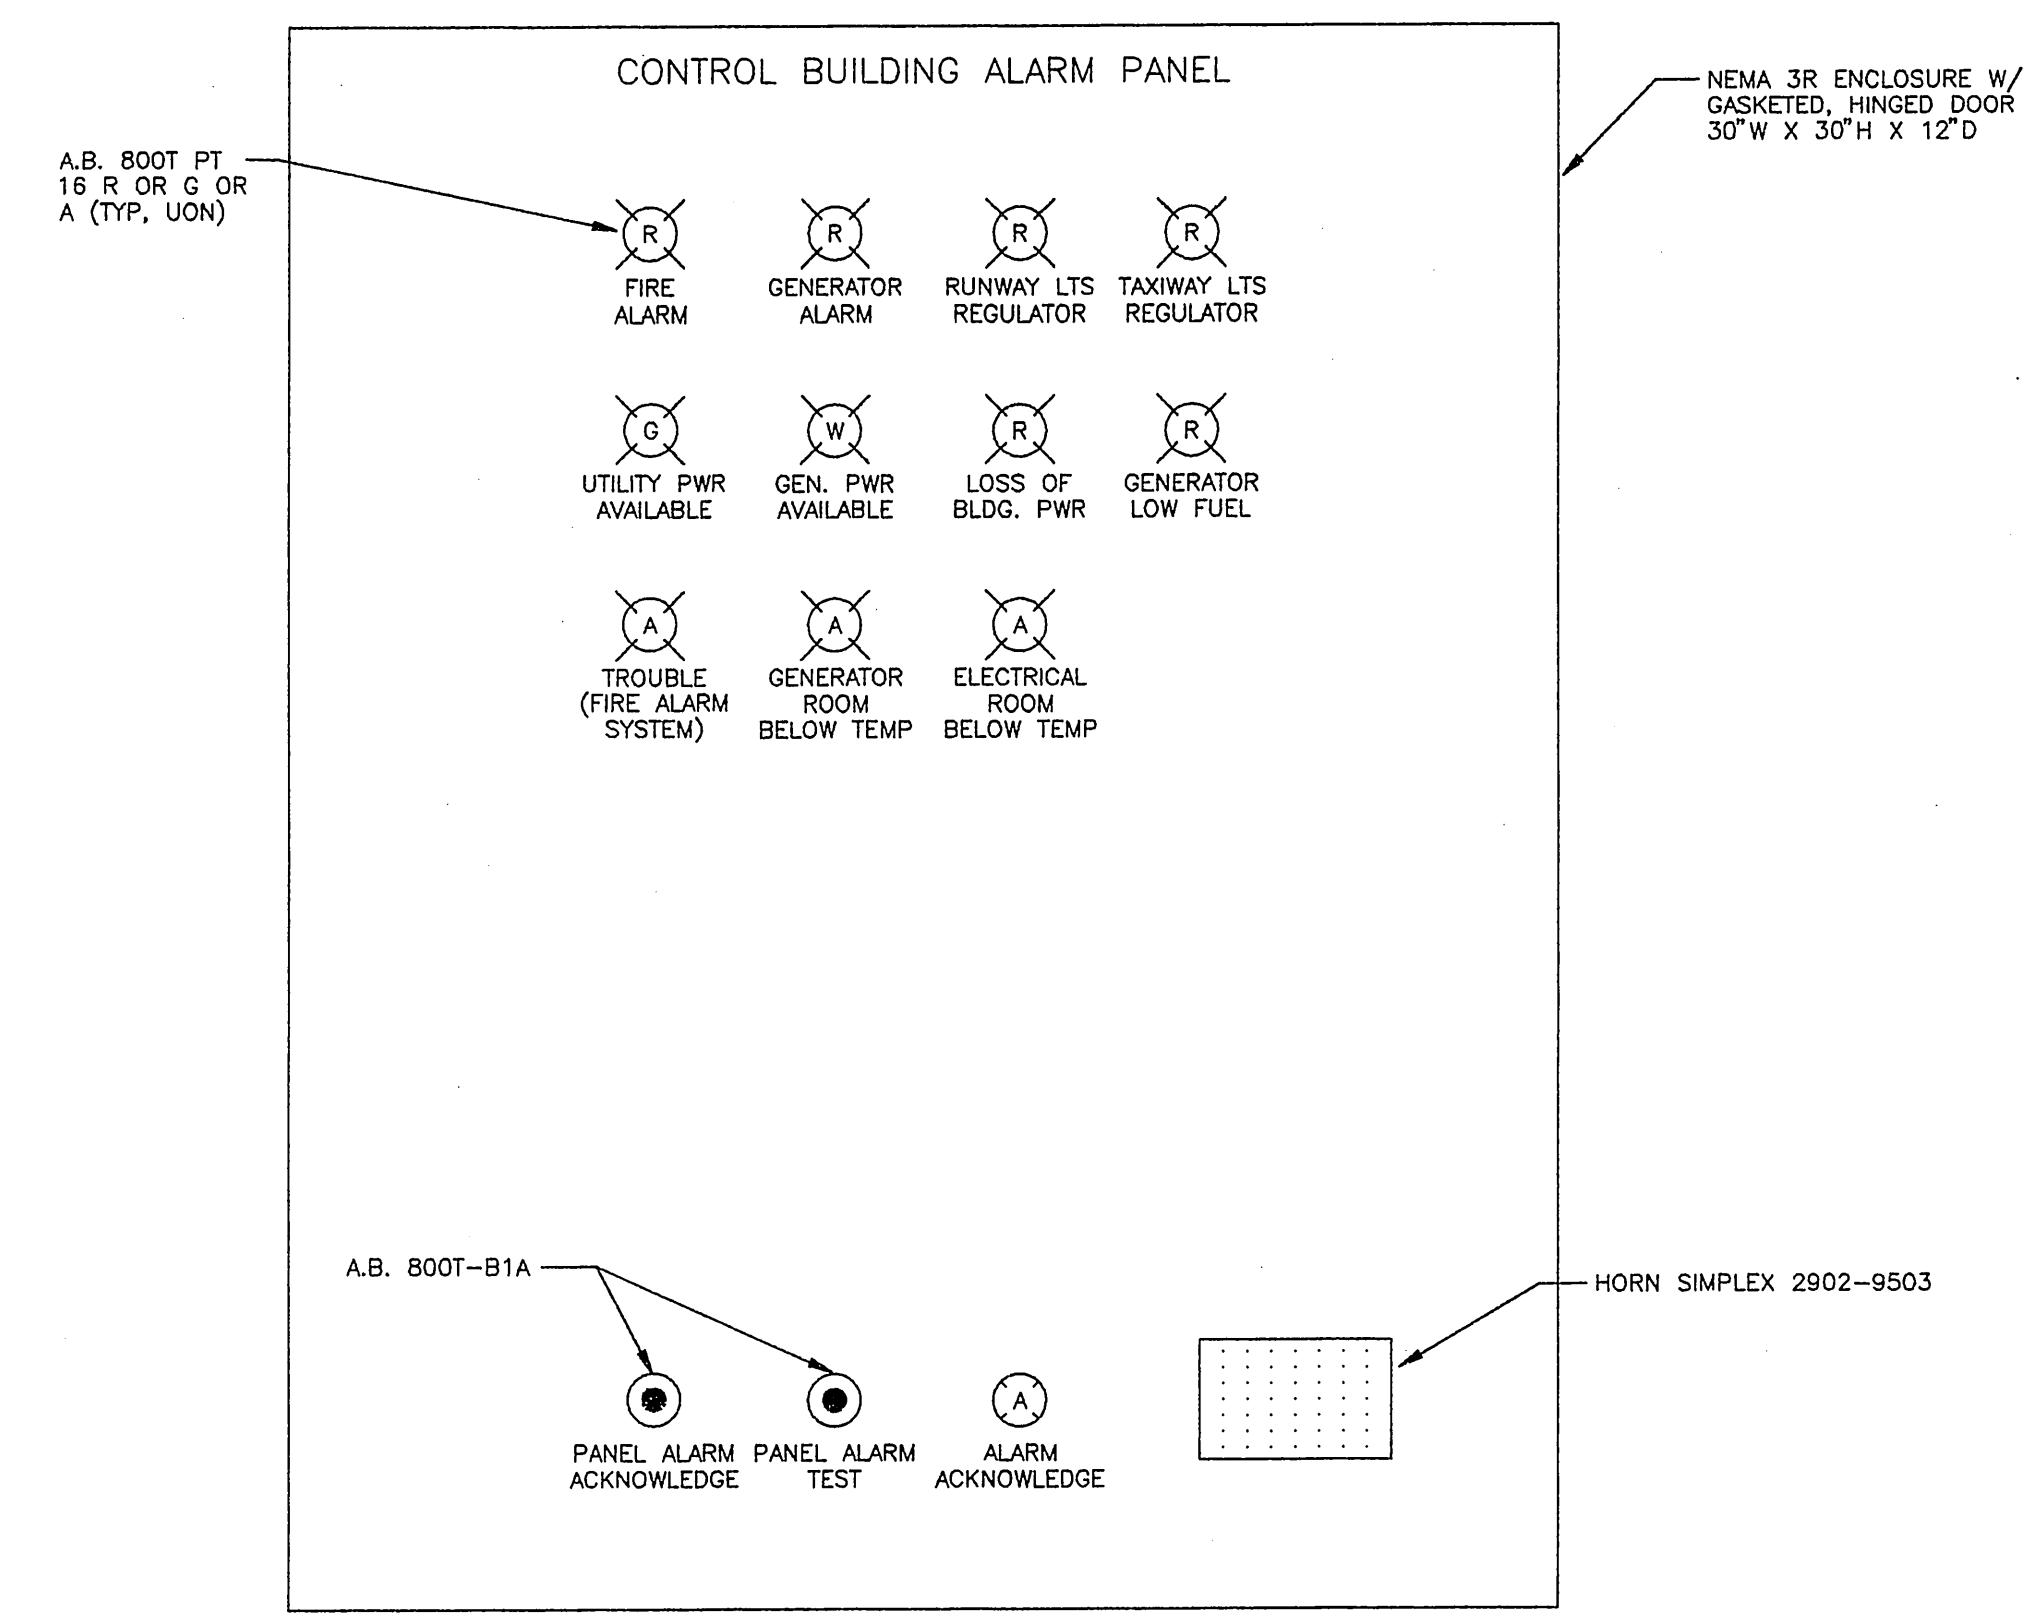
DETAIL - REMOTE & LOCAL BUILDING ALARM PANEL INTERIOR
